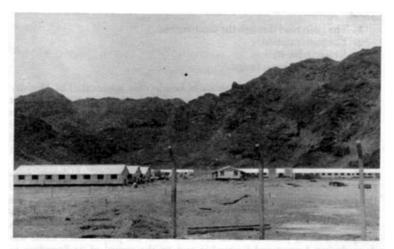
View of Anzio under construction from the north with Officers living huts on the left.
